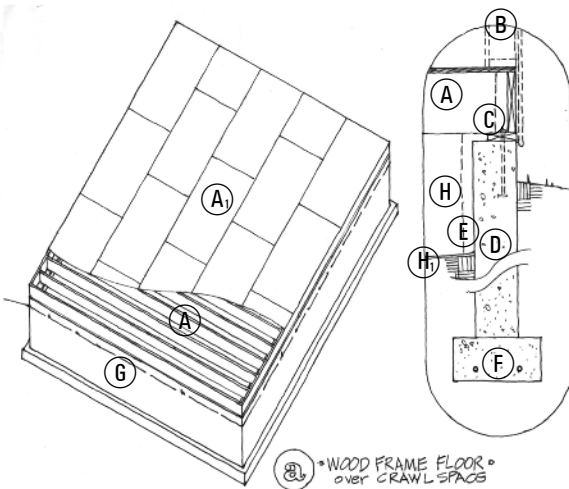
Another type is a wood platform that sits off the ground (on some type of foundation wall). It can sit off the ground far enough to form a crawl space or a basement as shown. Figure 1-6a also shows a basement foundation.
